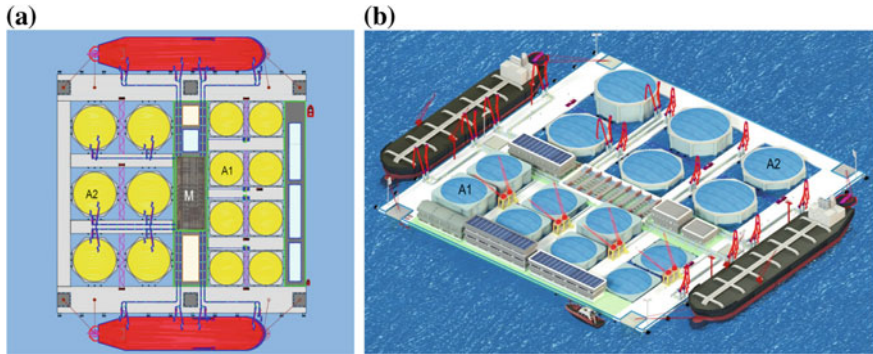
Floating hydrocarbon storage and bunker facility: a plan view and b architectural rendering view
